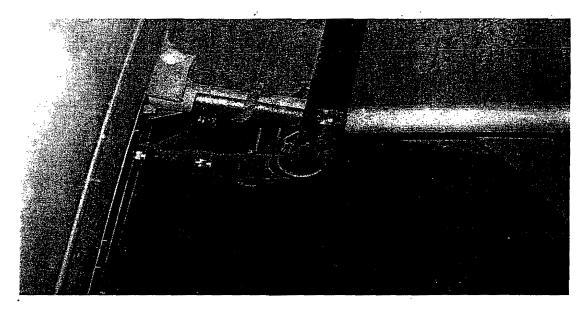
Sub Junction Level, Concealed Space between East 2-hour Shaft Wall of Room SJ1, looking North.
